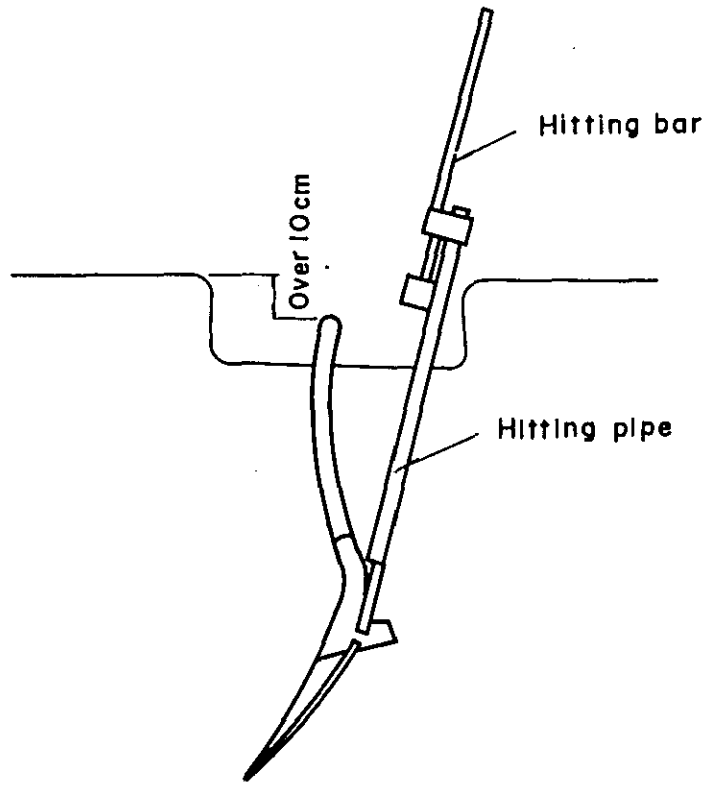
Installation of Stay Anchor (2/4)
